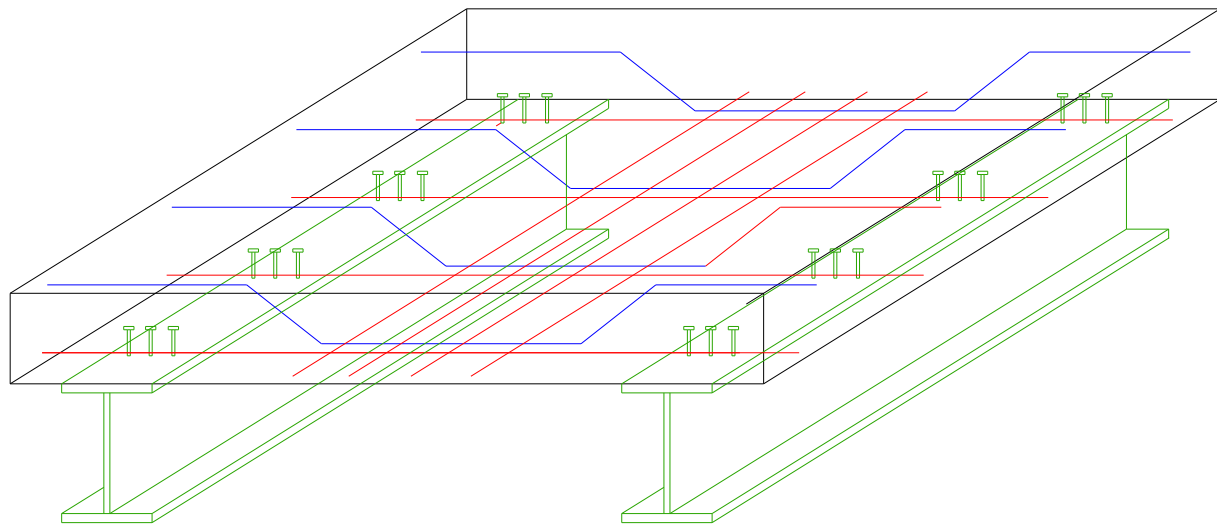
Typical bridge deck slab using flexural design method. Blue signifies top bent reinforcement, red signifies bottom reinforcement
